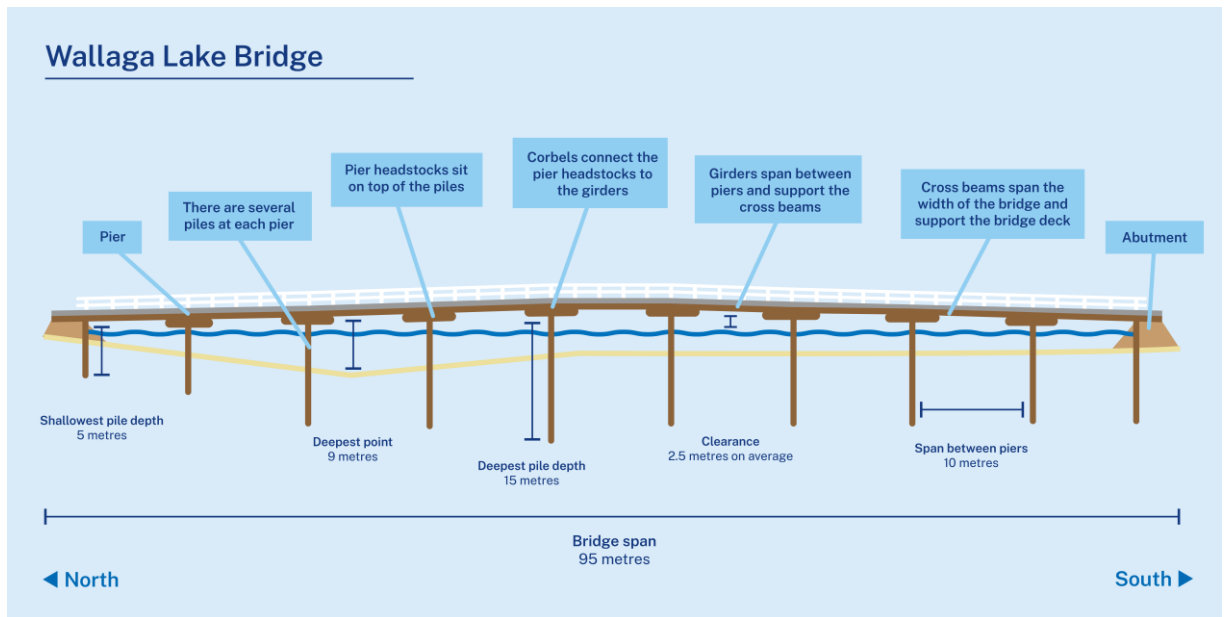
Image detailing various elements of the Wallaga Lake Bridge
